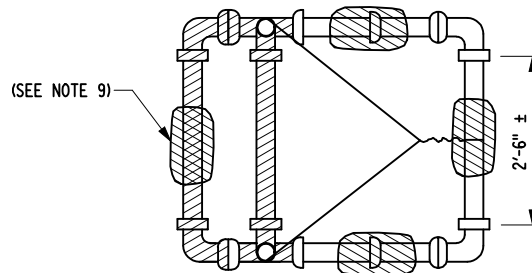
DETAILS FOR FASTENING LIGHTS ON TOP OF BARRICADE
